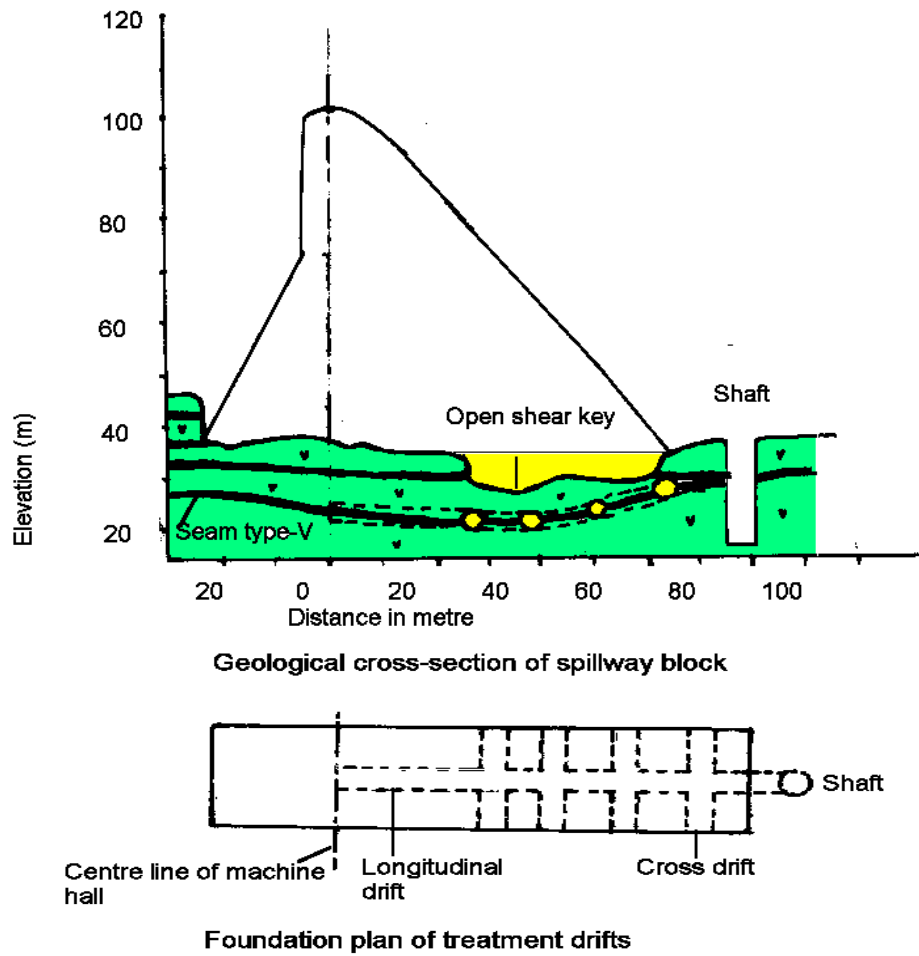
Treatment of Weathered rock seams: Open concrete shear keys at shallow depth and underground concrete shear keys at depth (Adopted from [6]).
